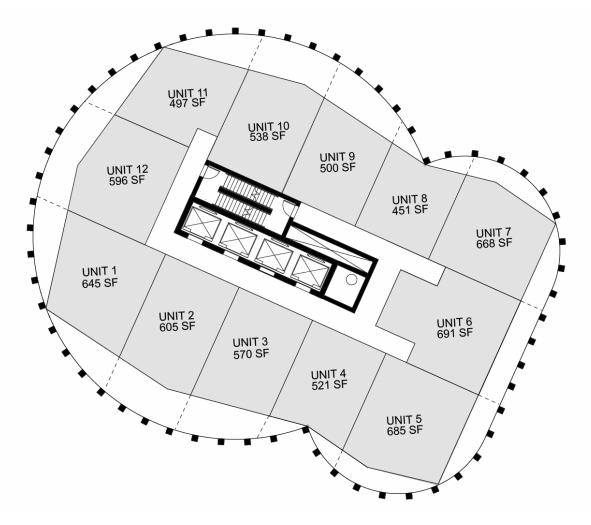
Typical Tower Floorplate Design (Floors 3 through 30) (KPMB Architects)
